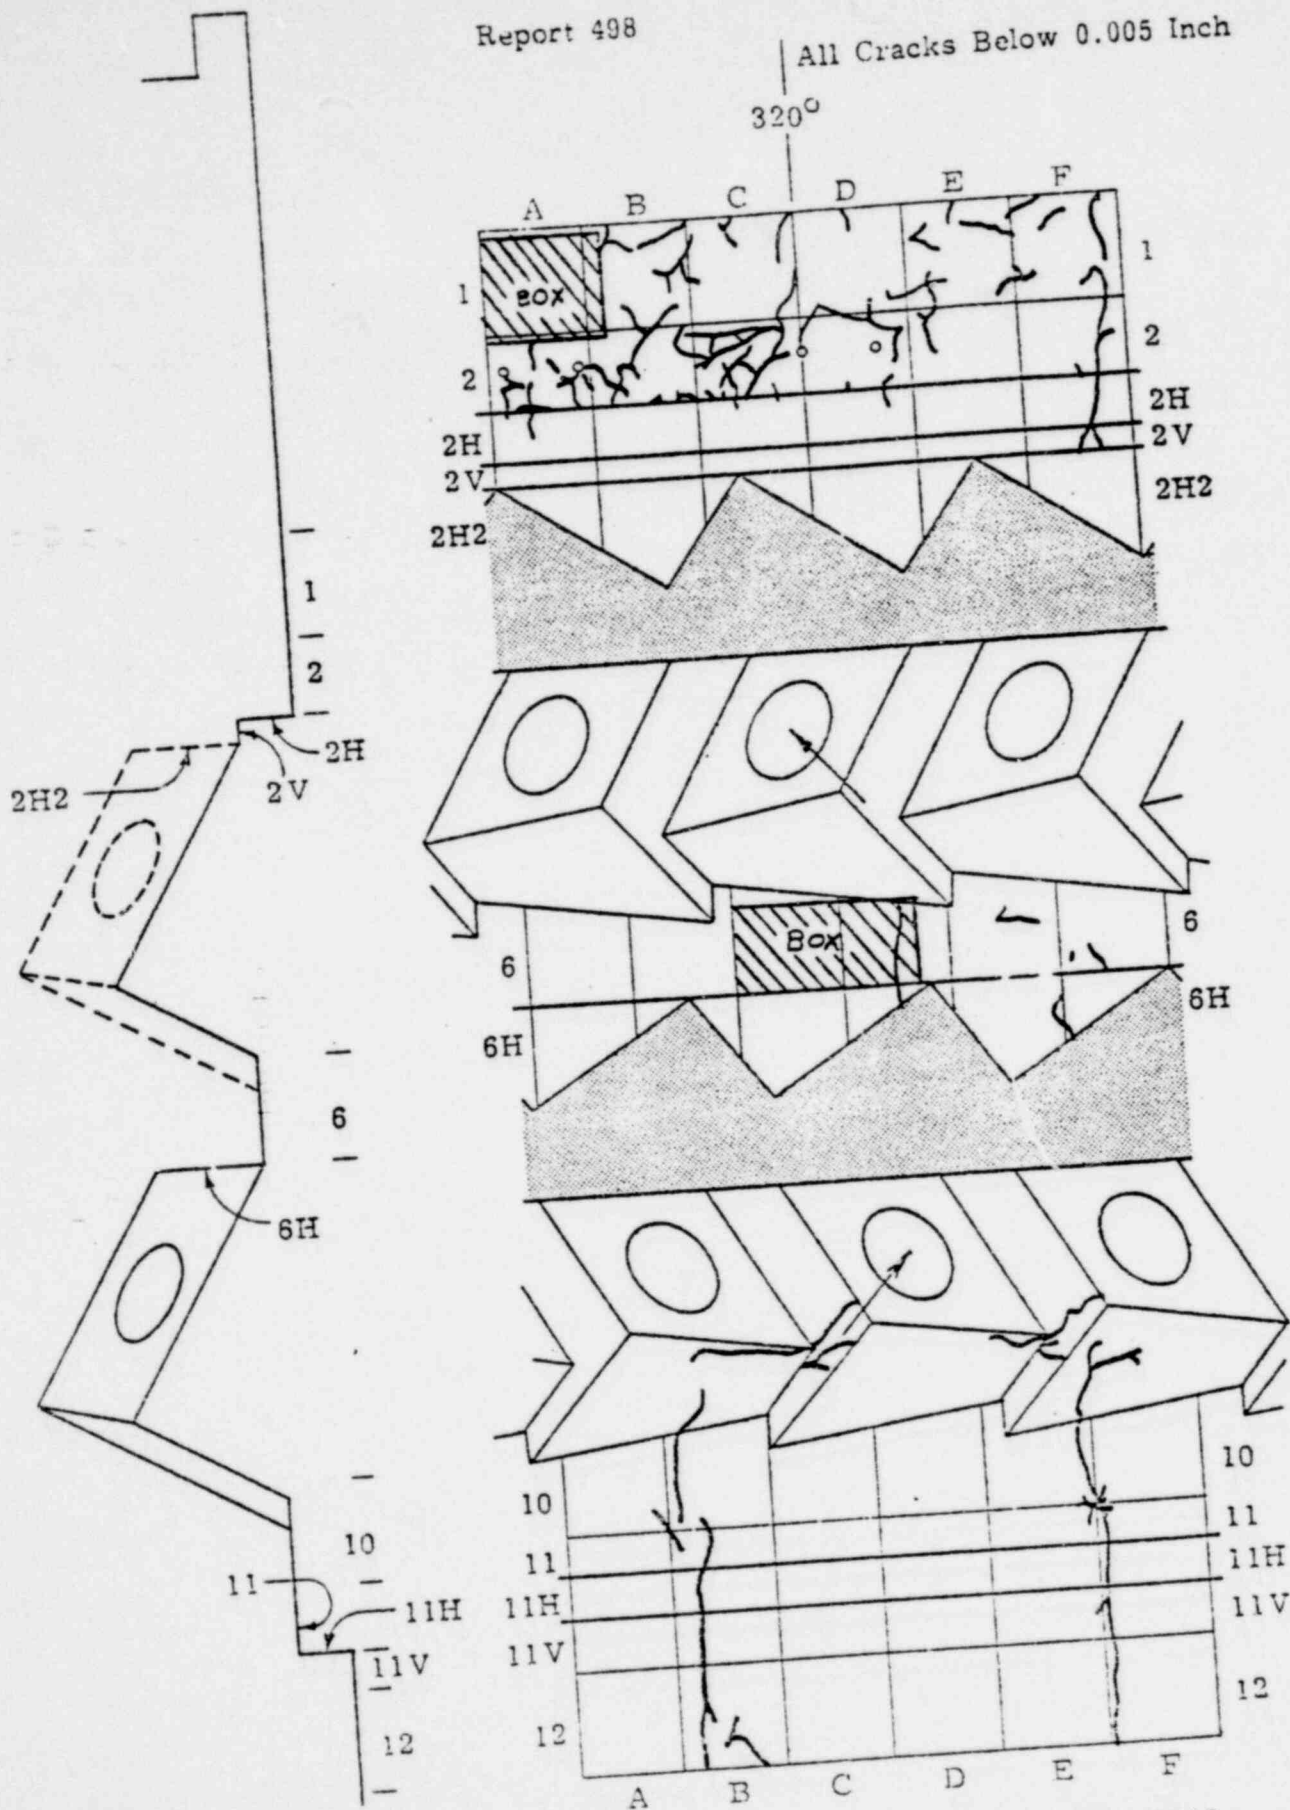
CRACK PATTERN AT AZIMUTH 320° FULL VERTICAL AND DOME PRESTRESS, JULY 5, 1973.
